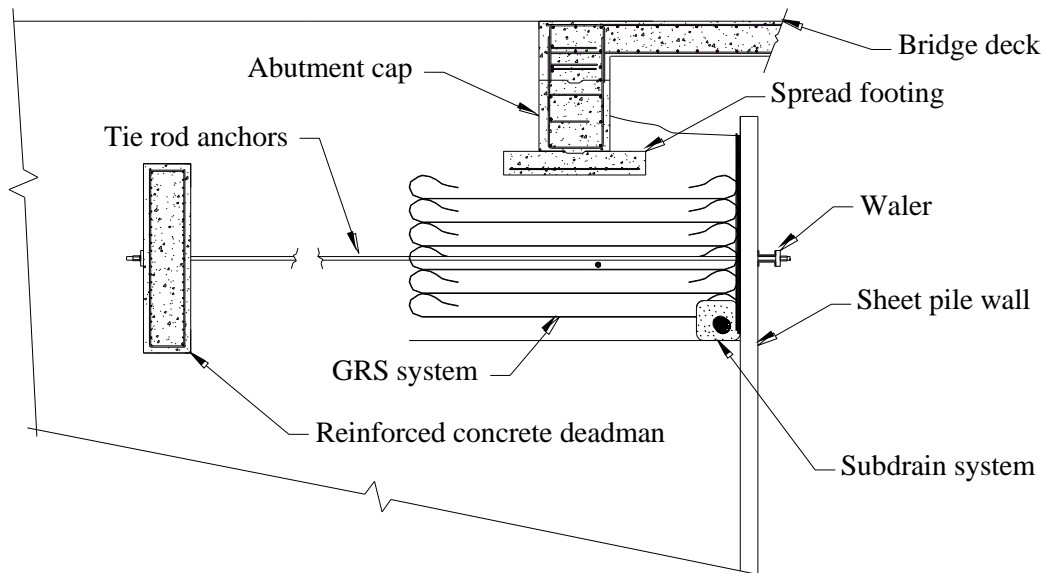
Cross-section of sheet pile abutment foundation system designed by ISU
